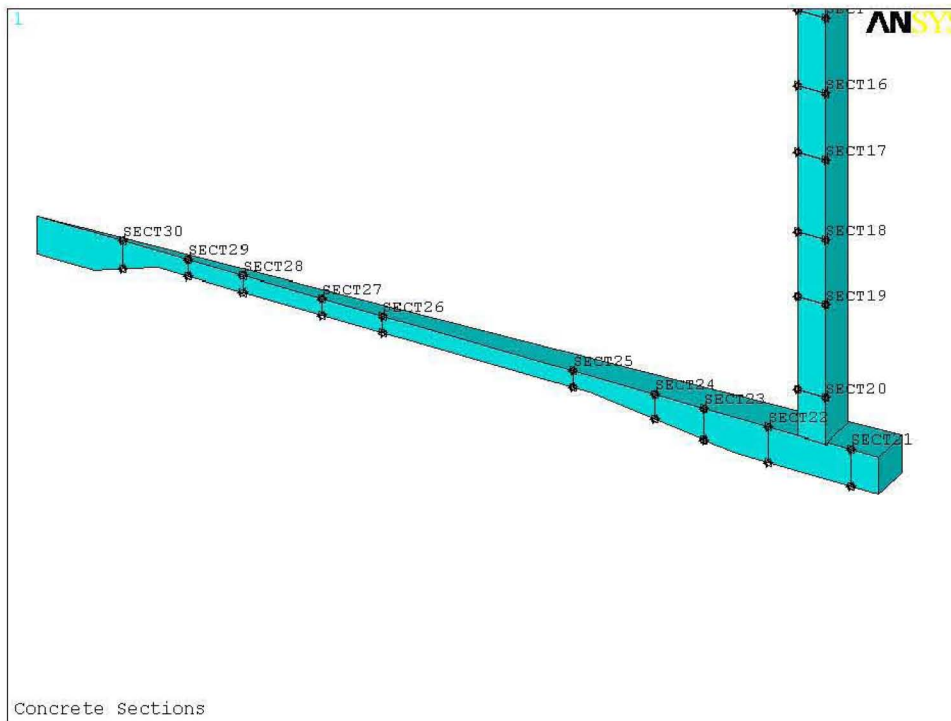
Reinforced Concrete Sections – Dome and Haunch Area
